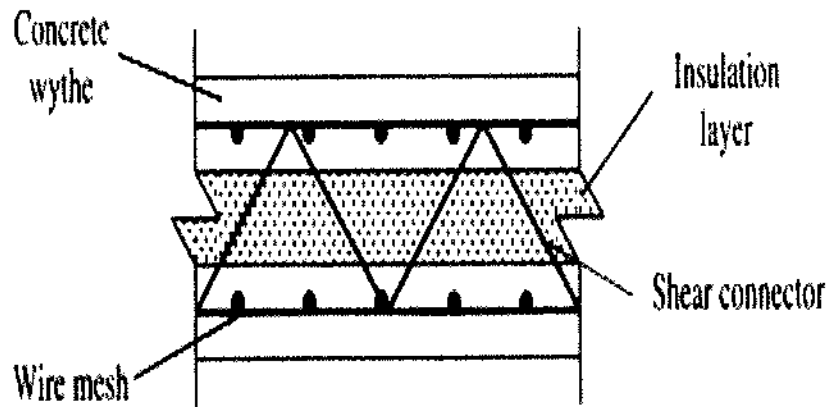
Components of Precast Concrete Sandwich Panel with Truss-Shear Connector [12].
